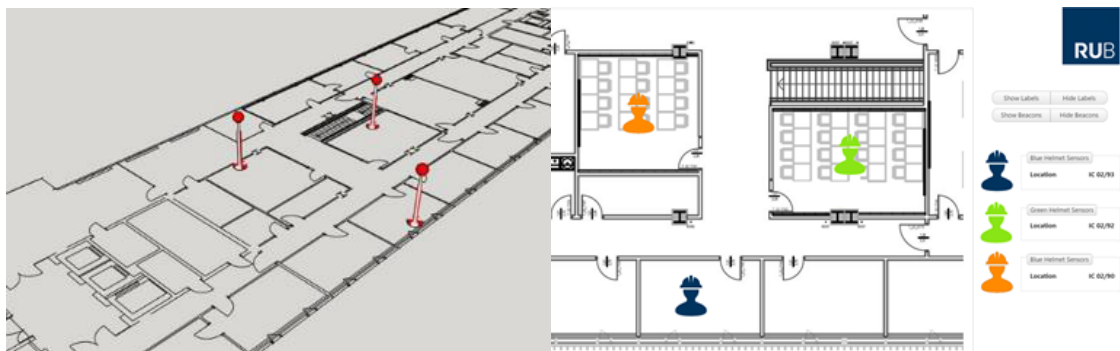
Position of BLE beacon and workers on a BIM plan [1]
